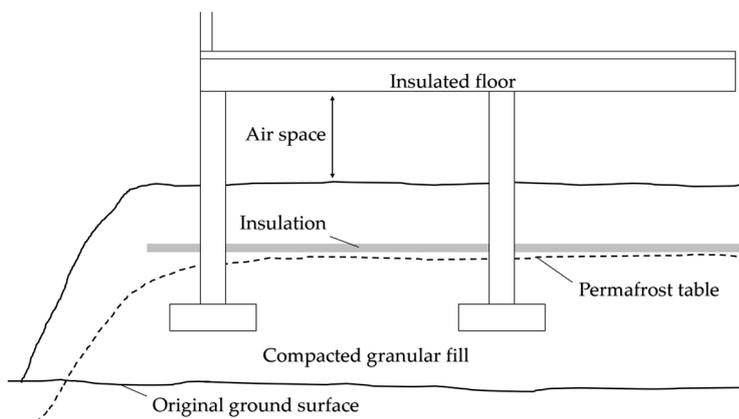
Example of a possible footing foundation (adapted from McFadden [16]).
